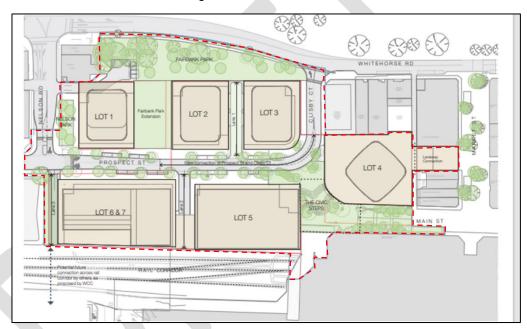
Development Plan, Box Hill Central North Master Plan (2022)
